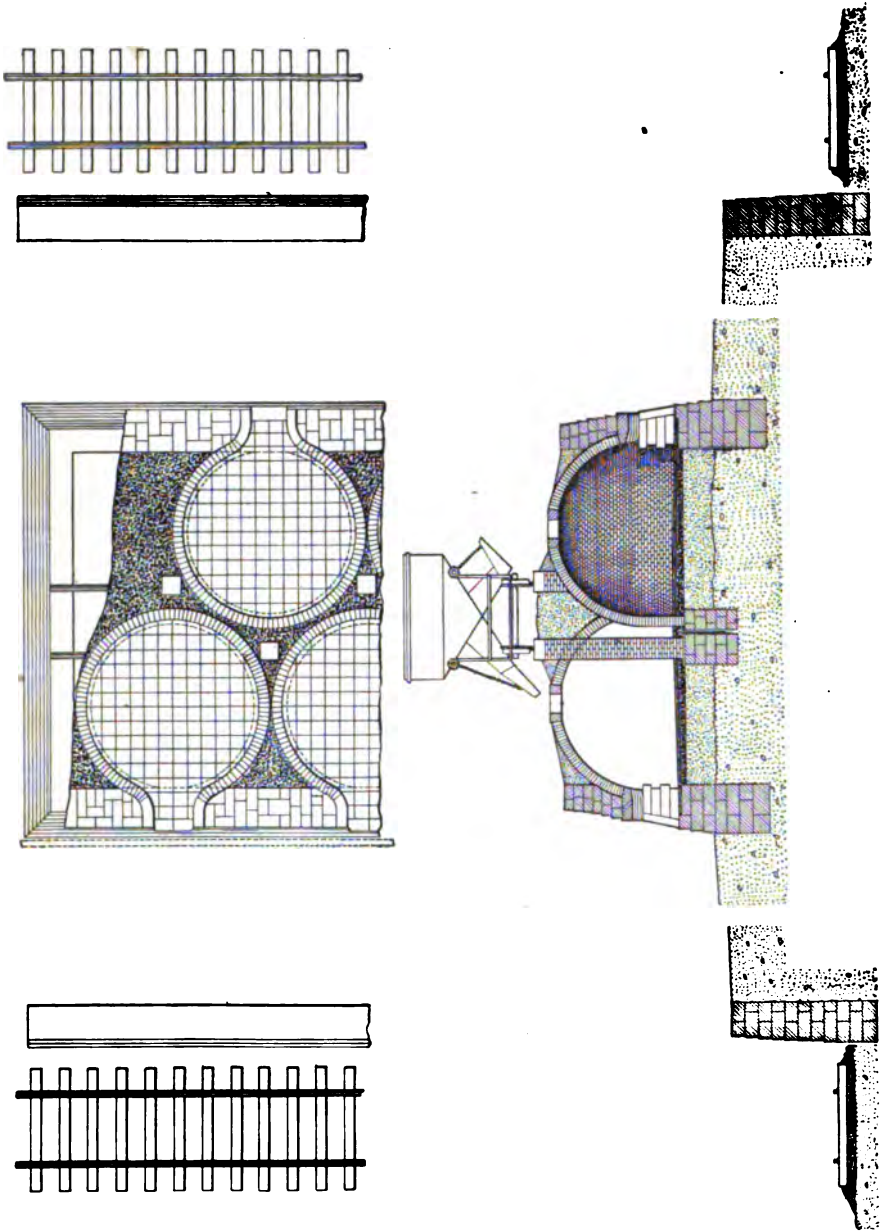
BEEHIVE OVENS, INTERLOCKING PLAN OF ARRANGEMENT
